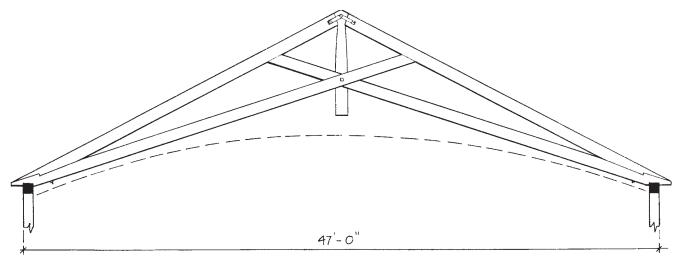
Elevation of Scissor Truss at First Parish Federated.
